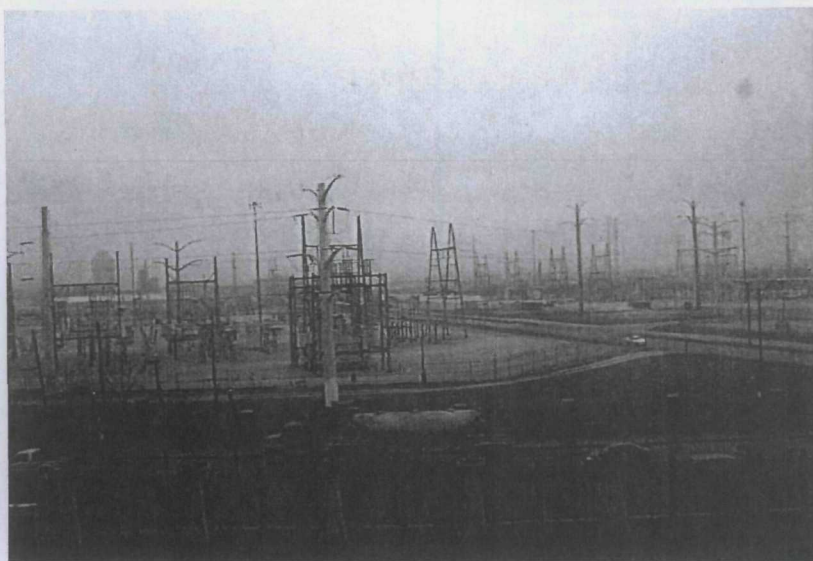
View across S. Pulaski Road to the west of ComEd switch yard.
